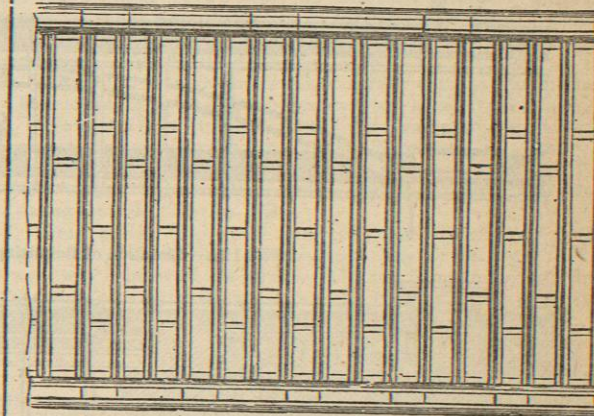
Britannia Bridge (Part Elevation of Tubular Girder).
